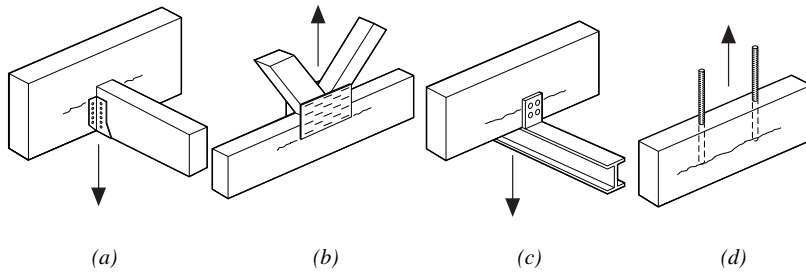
Examples of typical joints loaded perpendicular to the grain with possible crack paths. (a) joist hanger (steel-to-timber joint), (b) punched metal plate fasteners as gusset plate, (c) joints with dowels or connectors, (d) glued-in rods. (STEP 1995 Article C2)
